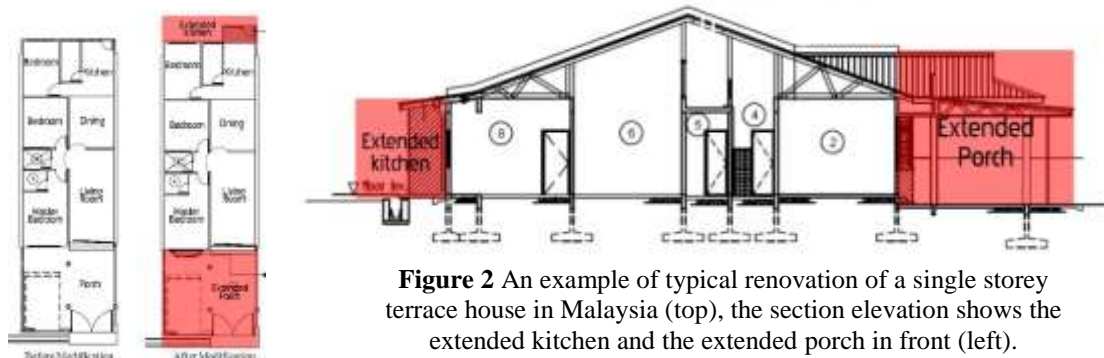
An example of typical renovation of a single storey terrace house in Malaysia (top), the section elevation shows the extended kitchen and the extended porch in front (left).
